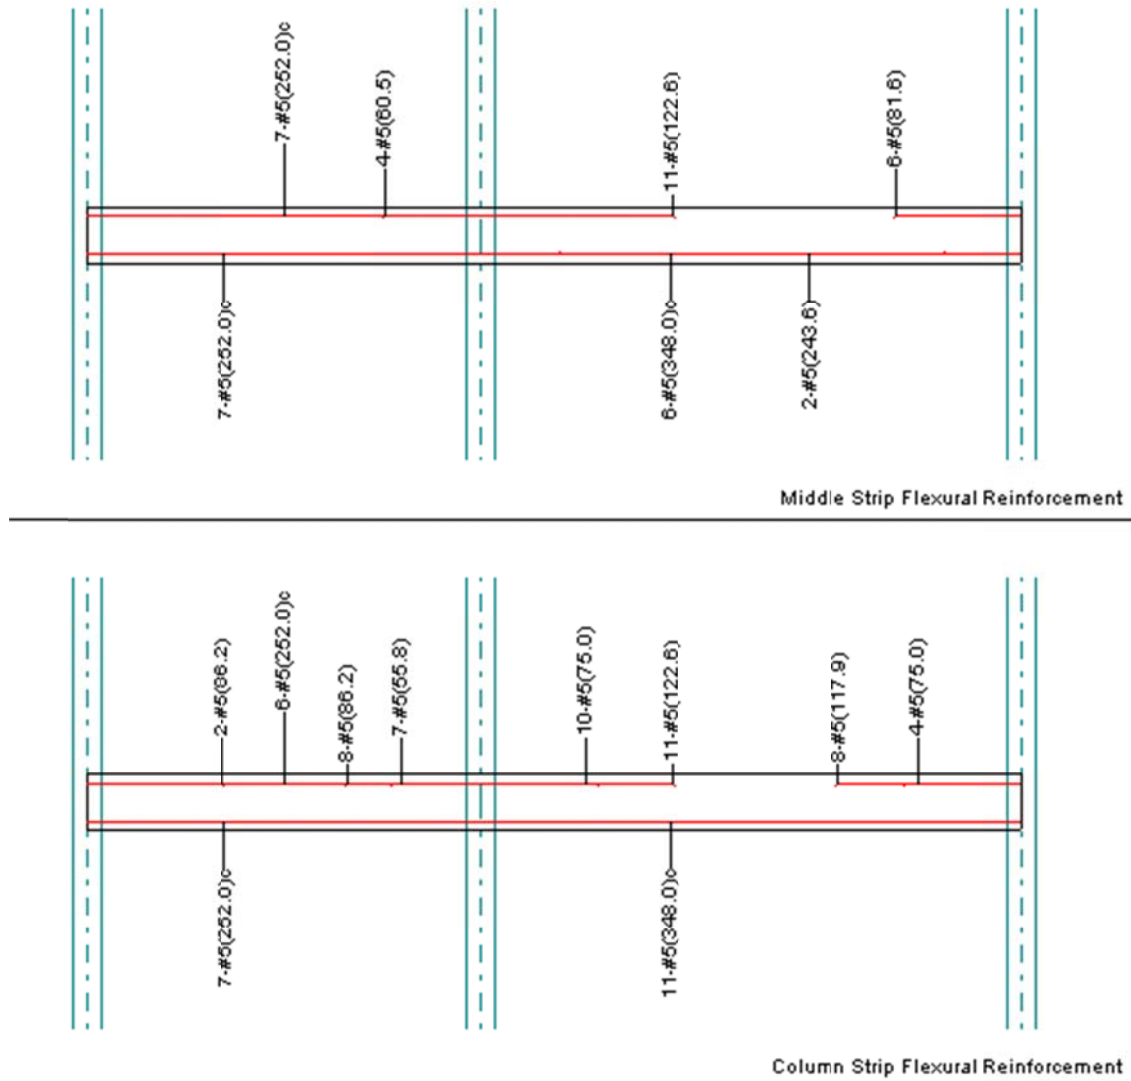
spSlab Column Line 4.5 Reinforcing Diagram
